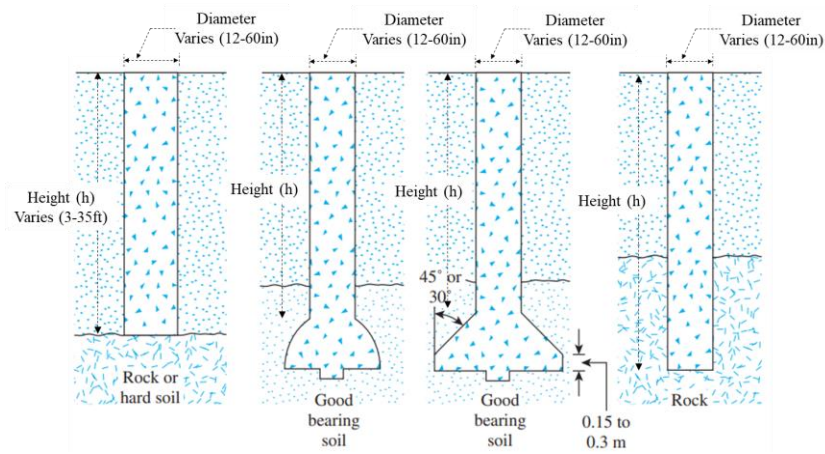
Typical sections of drilled shafts foundations. (Adapted from Das, 2014)
